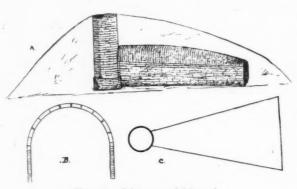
Diagram of Mound. a. Elevation. b. Section through arch. c. Plan.
